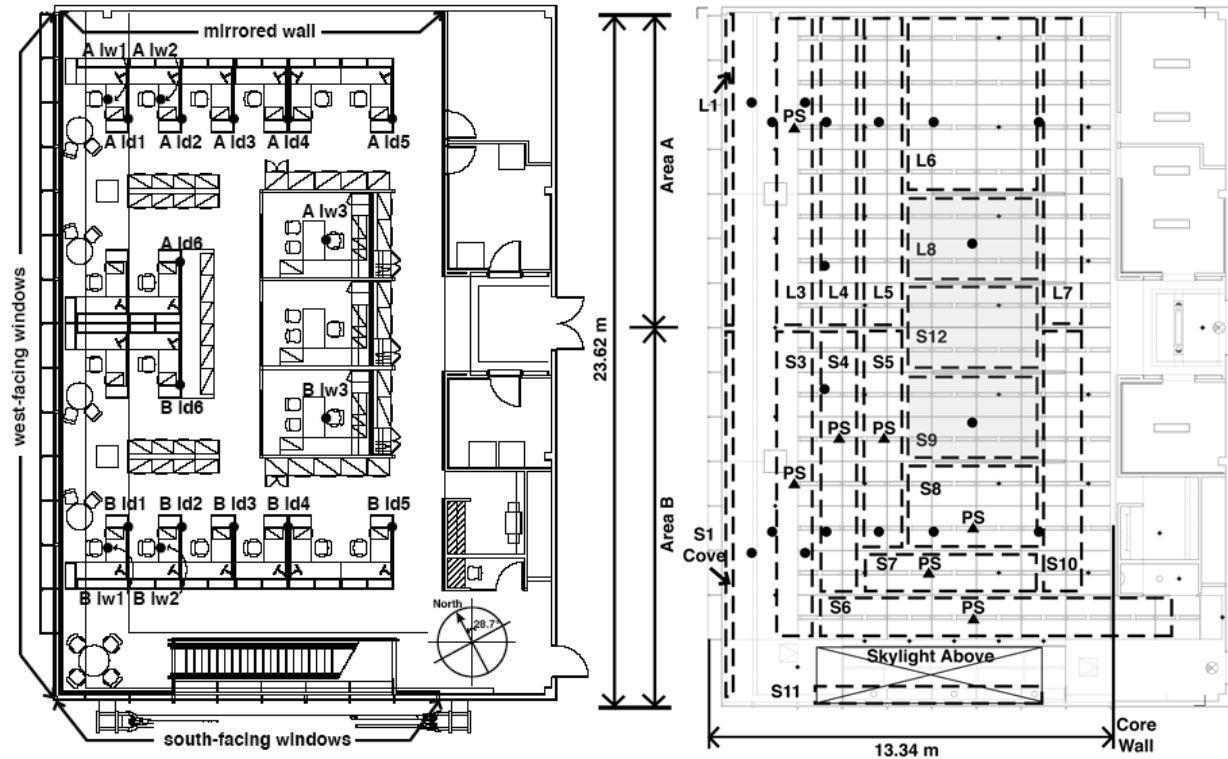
a) Floor plan showing the location of the interior illuminance sensors (left) and b) reflected ceiling plan (right) showing the lighting zones and location of photosensors (PS – triangle symbols). Note that there was not a one-to-one correspondence between illuminance sensors and the lighting zones above – illuminance sensor locations are shown on the reflected ceiling plan for reference. Photosensor in S4 was used to control grouped zone S4/S5 and photosensor in S7 was used to control zone S7/S8.
